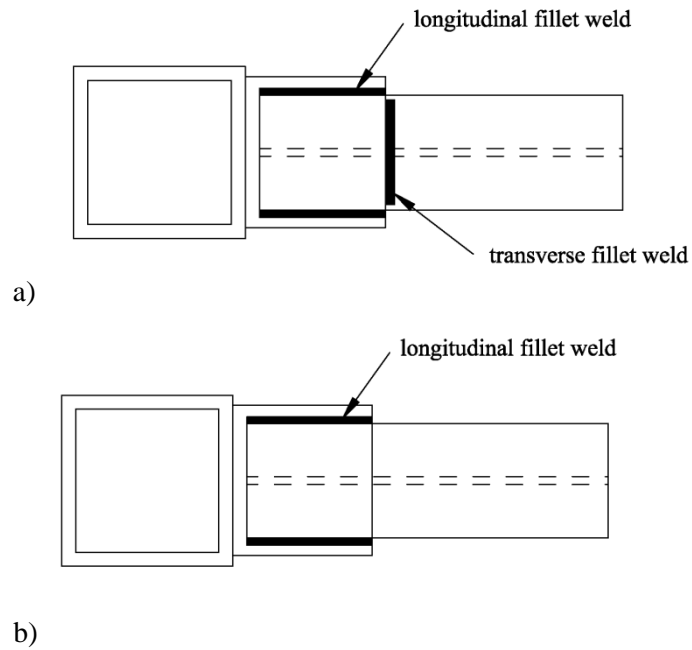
Fillet weld geometry: (a) LF30-T and (b) LF30
